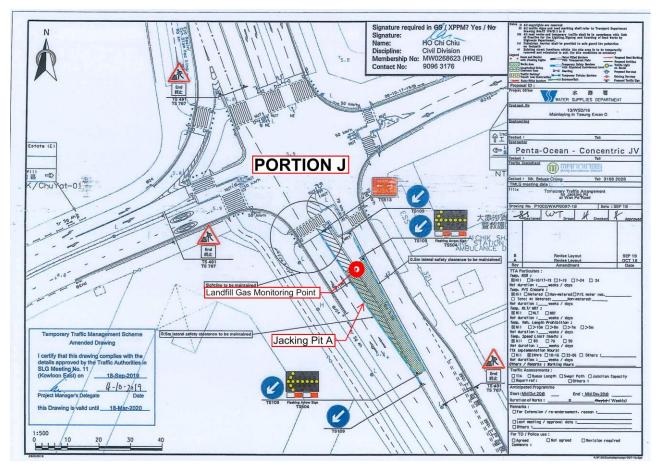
Location Plan for Portion J - CH. A13+50 to CH.A 14+00 (Pit A)
